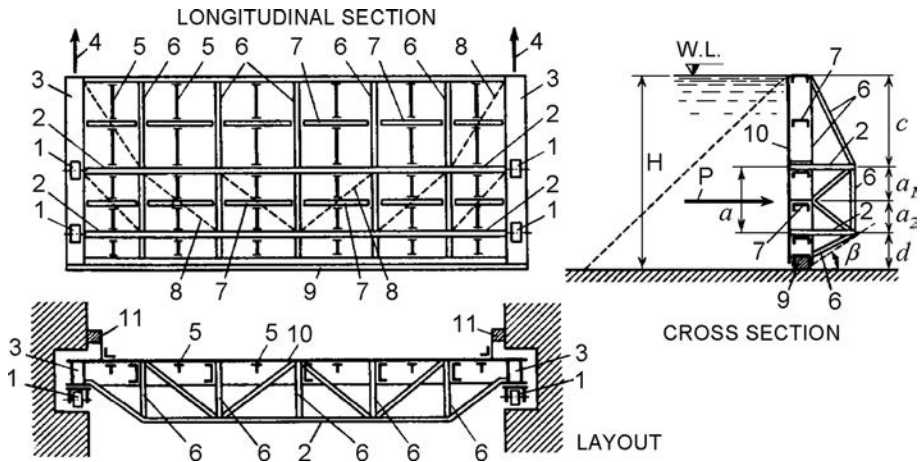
Scheme of ordinary two-beam plain gate. (1) Supporting movable part; (2) main beam; (3) end vertical stanchions; (4) lifting forces; (5) auxiliary vertical stanchions; (6) transverse vertical truss; (7) auxiliary beam; (8) lifting truss; (9) sealing at the bottom; (10) waterproof lining; (11) lateral sealing.
